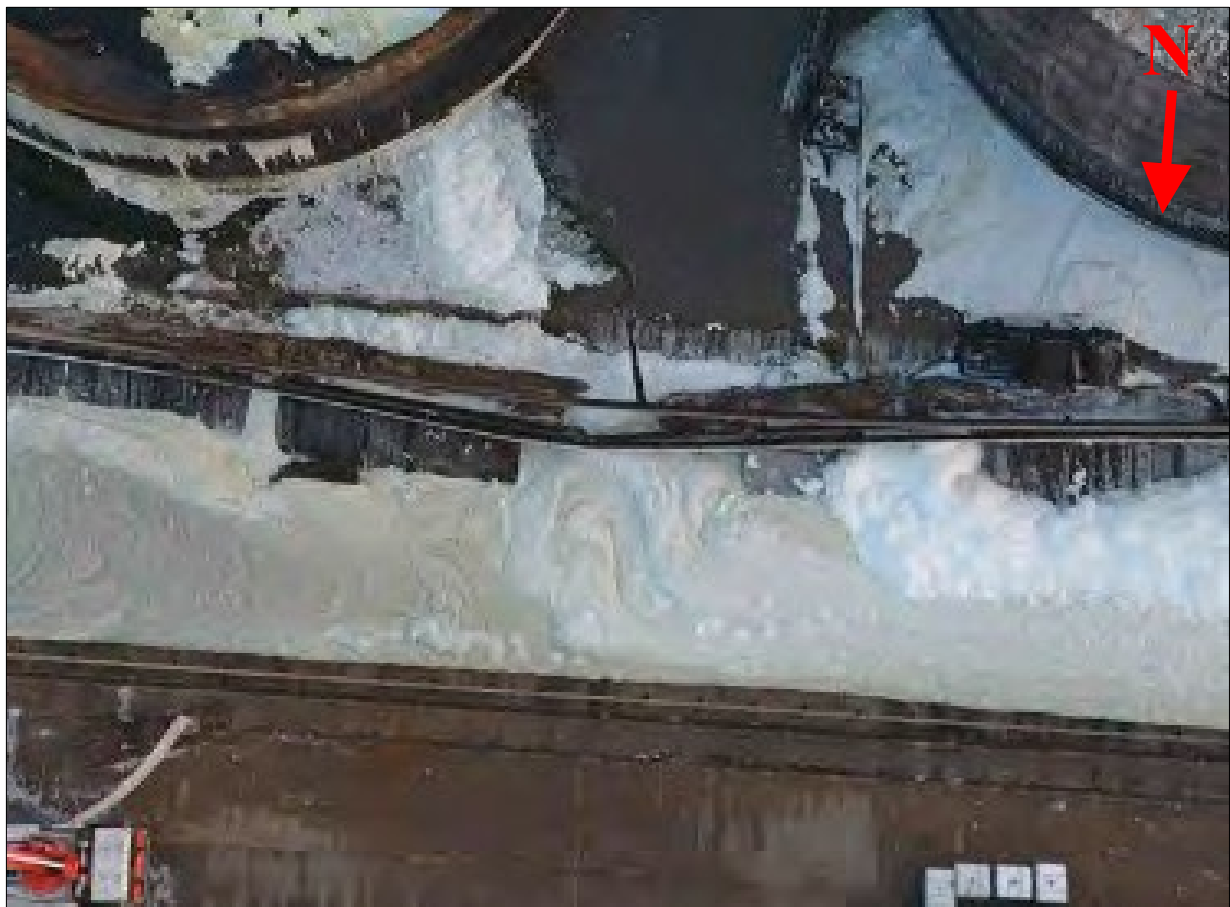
Closeup from aerial view of containment wall failure¹⁴
